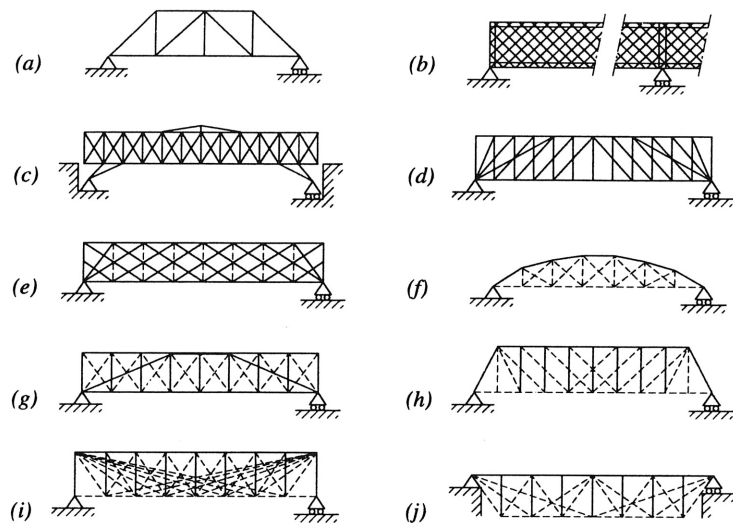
Development of timber bridge trusses. (a) Androskoggin bridge Brunswick, 1804, (b) Town lattice truss, 1819, (c) Col. Longs brace truss, 1830, (d) Haupt lattice truss, 1839, (e) Howe truss, 1840, (f) Whipple bowstring truss, 1841, (g) Pratt truss, 1846, (h) Whipple double-intersection truss, 1846, (i) Bollman truss, 1852, (j) Fink truss, 1857.
